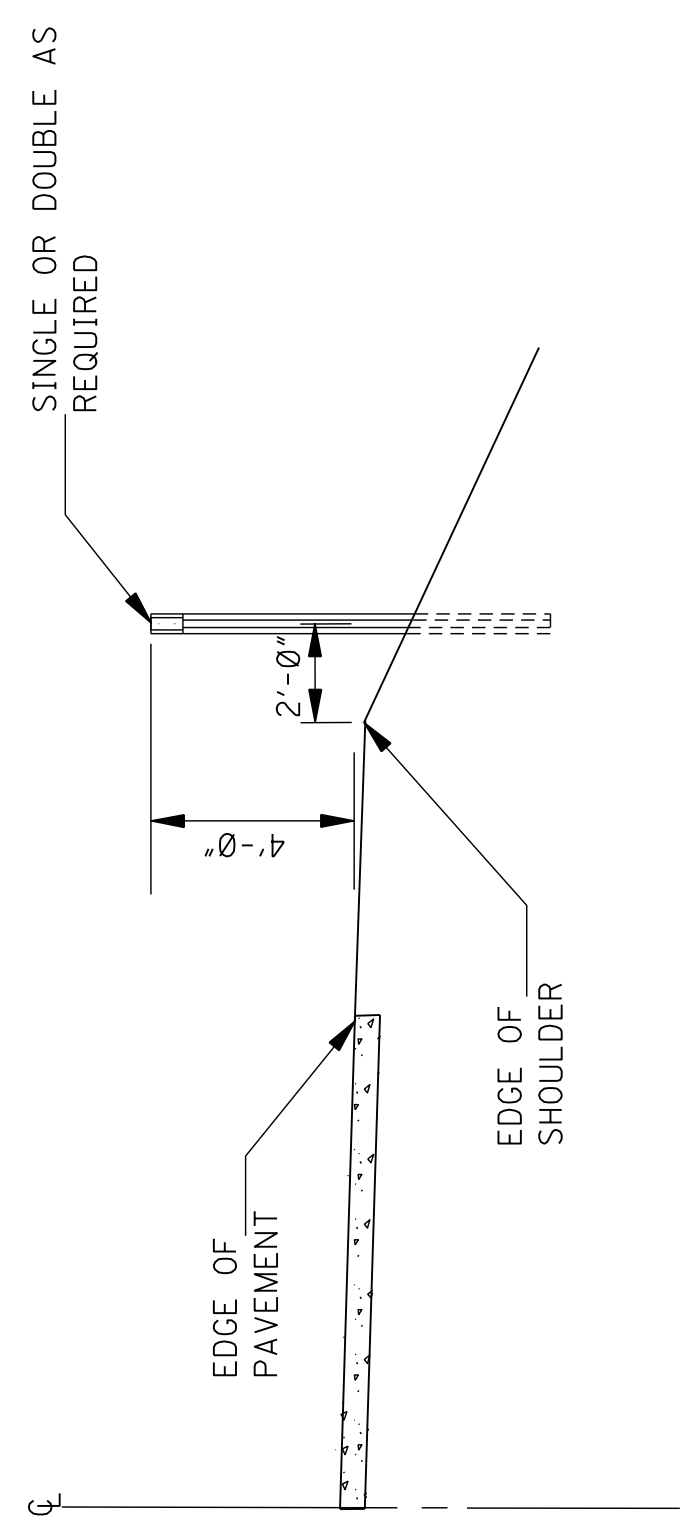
OBJECT MARKER INSTALLATION
